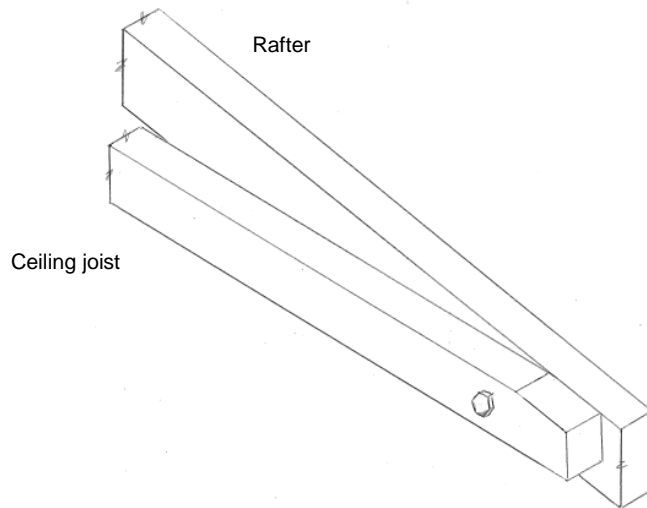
Upgrade E, improvement of connection of collar ties to rafters by installation of 1 M12 bolt.
